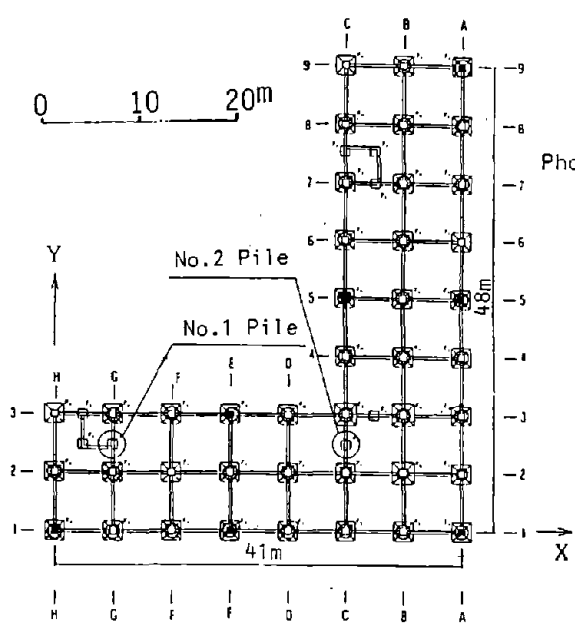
Footings and Foundation Beams of Niigata Family Court House
